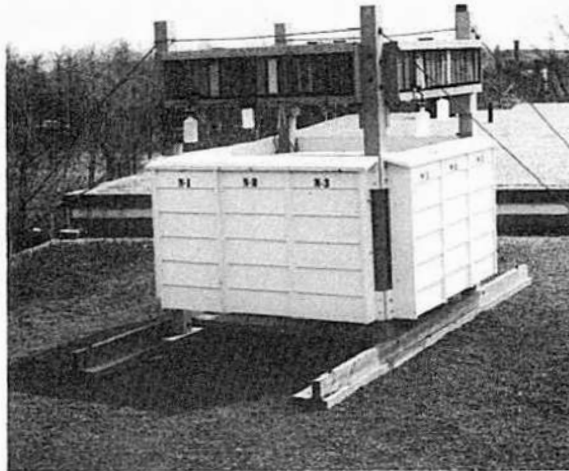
Completed assembly showing North and West exposure — rain cups above panels.
